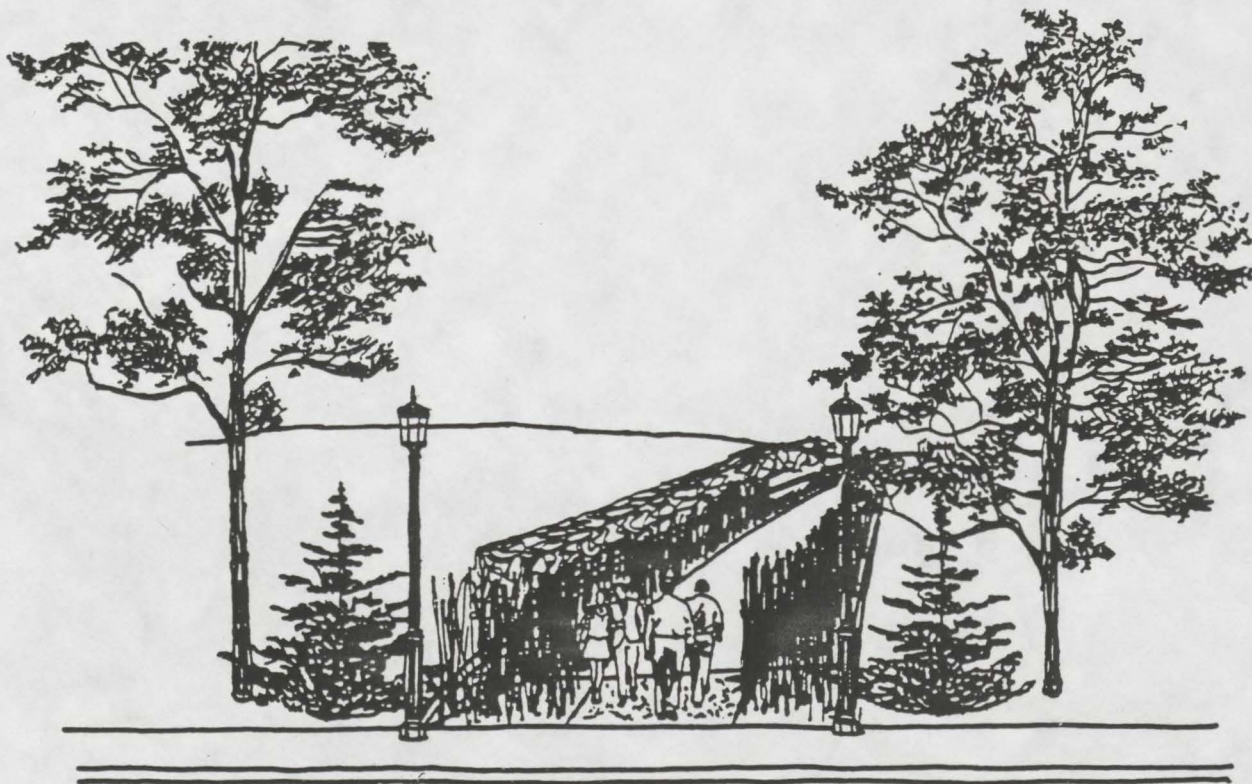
Entrance to Railroad Revival Walk from 5th Avenue.
